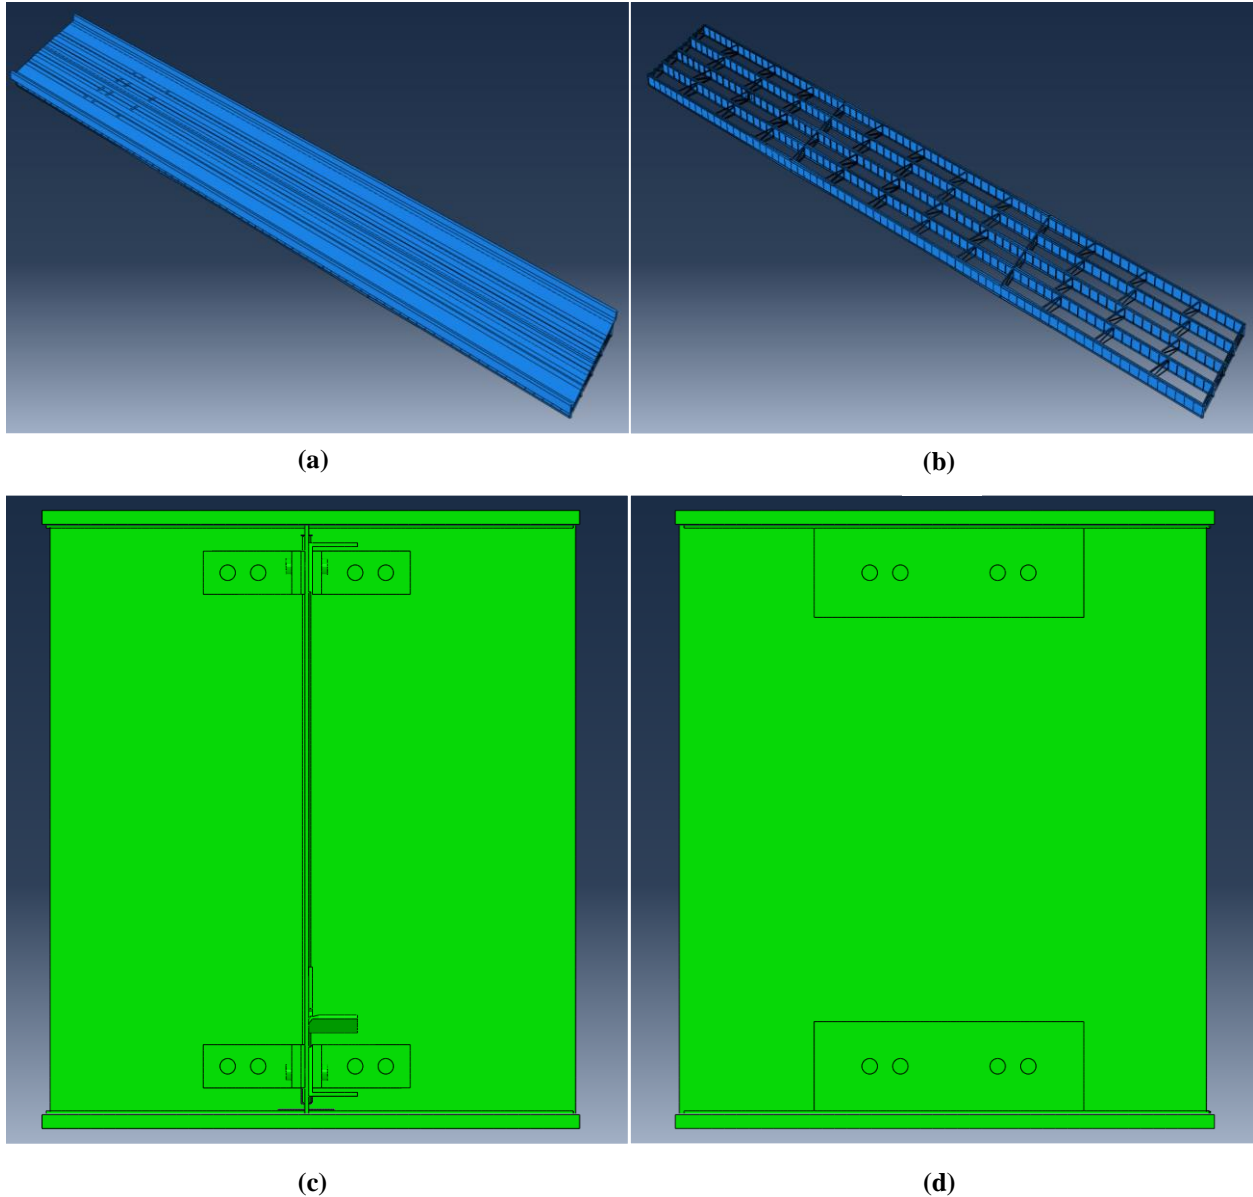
(a) Full scale model with concrete deck (b) Full scale model without concrete deck (c) stiffener side of Girder C with angles-with-plate retrofit (d) non-stiffener side of Girder C with angles-with-plate retrofit.
